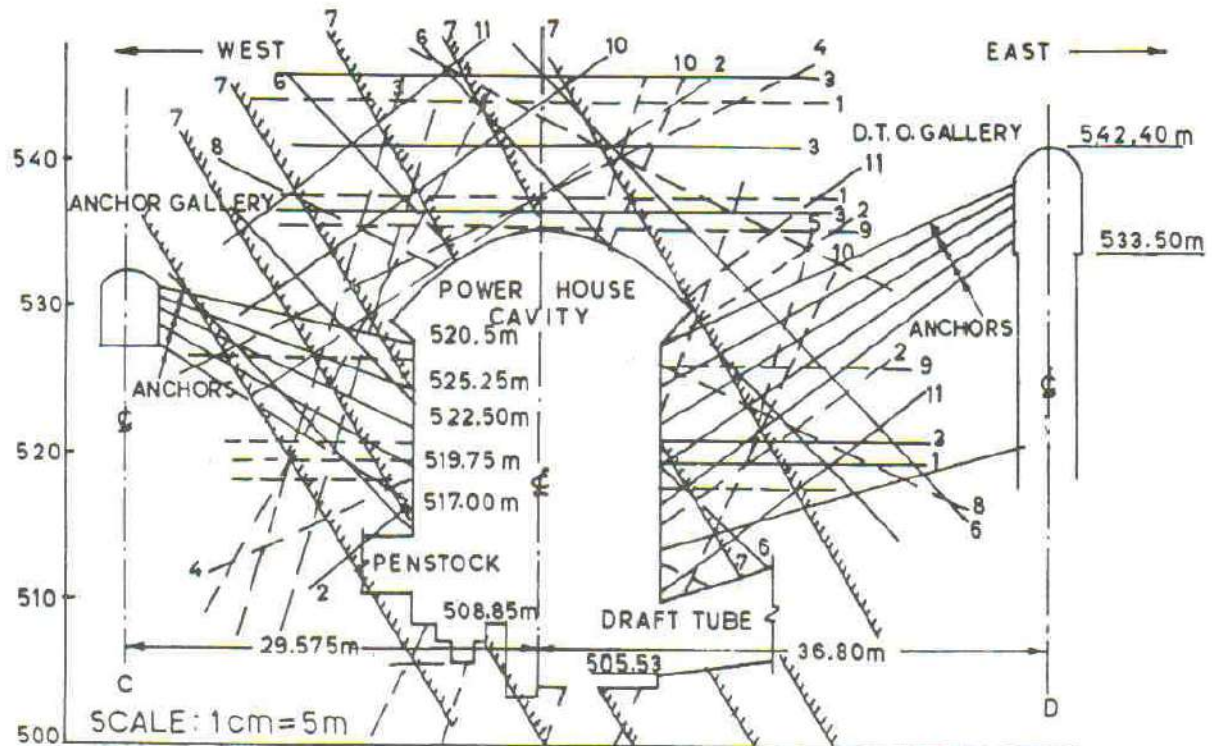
GENERAL LAYOUT OF CHHIBRO UNDERGROUND POWER HOUSE COMPLEX
